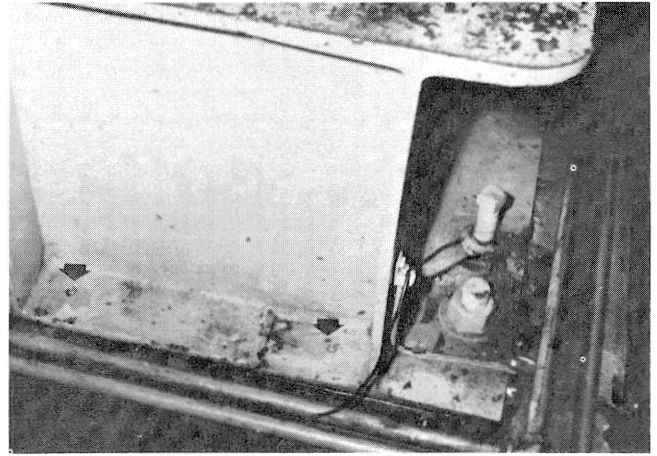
A View of a Corner of a Platform where the Lower "I" Beam Flange has been Pressure-Grouted with Epoxy to Bond the Platform to the Concrete Foundation. Arrows Indicate the Points of Injection Through Grease Fittings.
